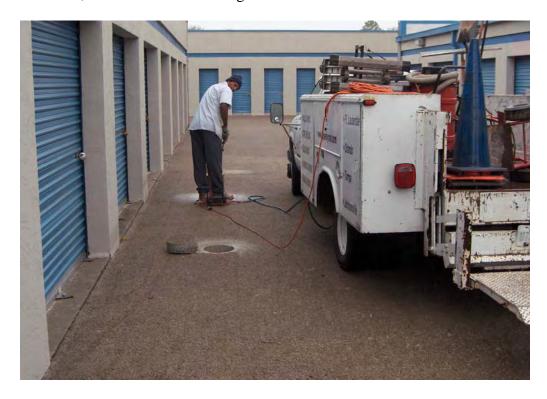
Sun Ray Store-Away Pervious Pavement at Core Locations 1, 2 & 3
